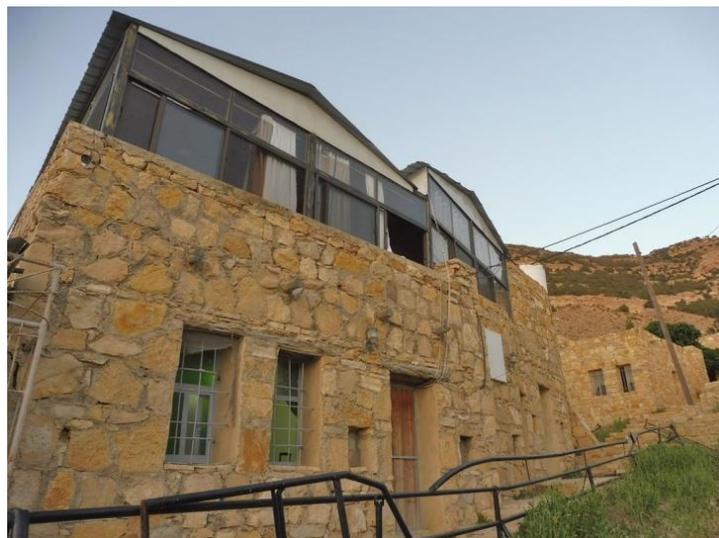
Additional floor on the short side of the rebuilt part of Dana hotel (Author 2019)
